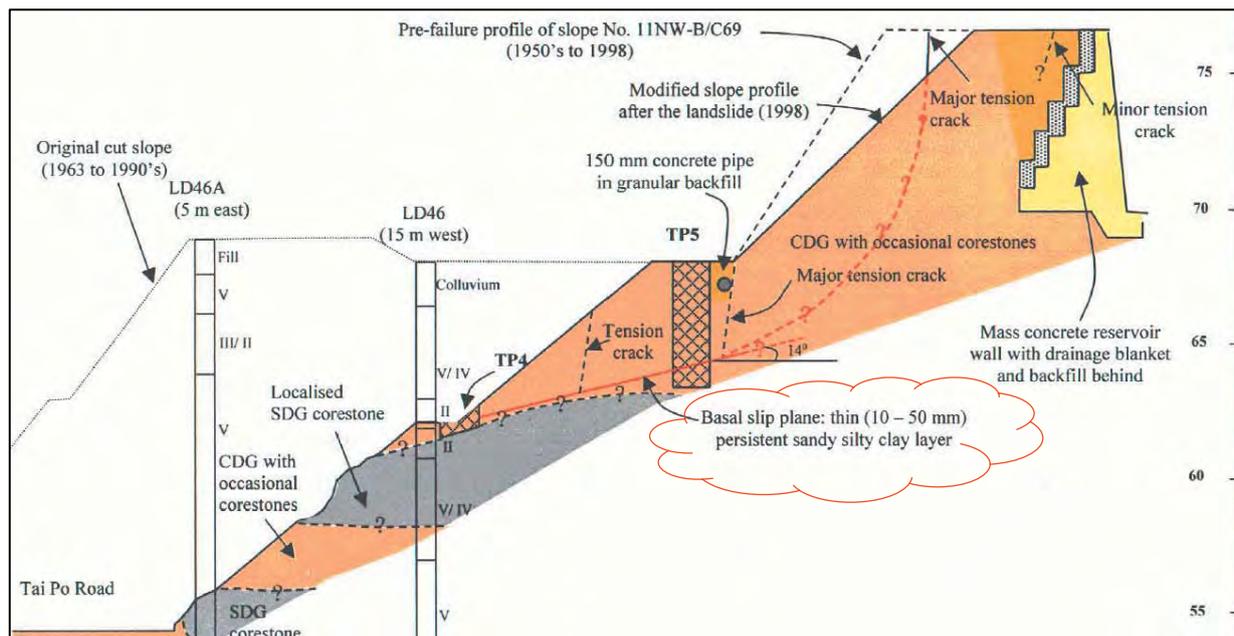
Section through 1998 Tai Po Road landslide opposite Chak On Estate (FSW, 2001b)
